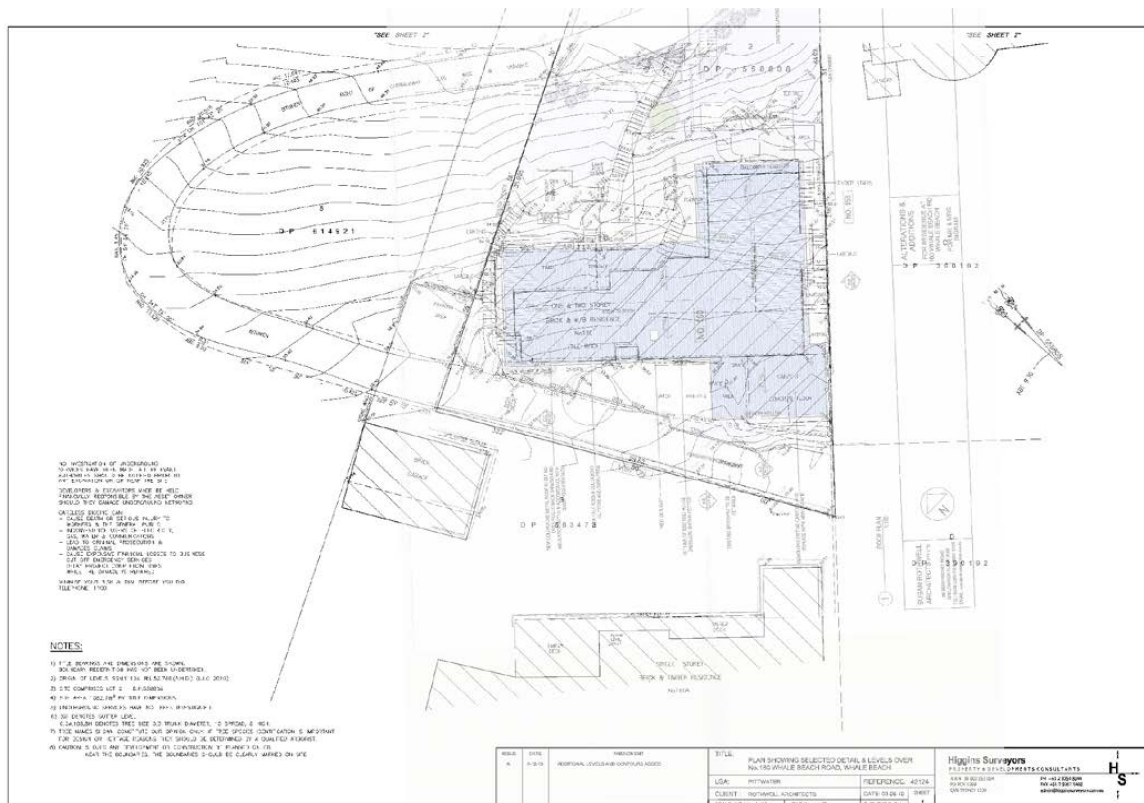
Overlay of survey and Roof plan (DA103, Issue B)
